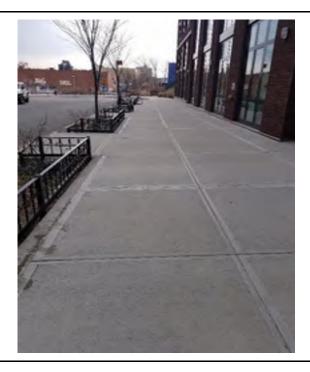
1st Street sidewalk, facing southeast. 27 February 2019.
